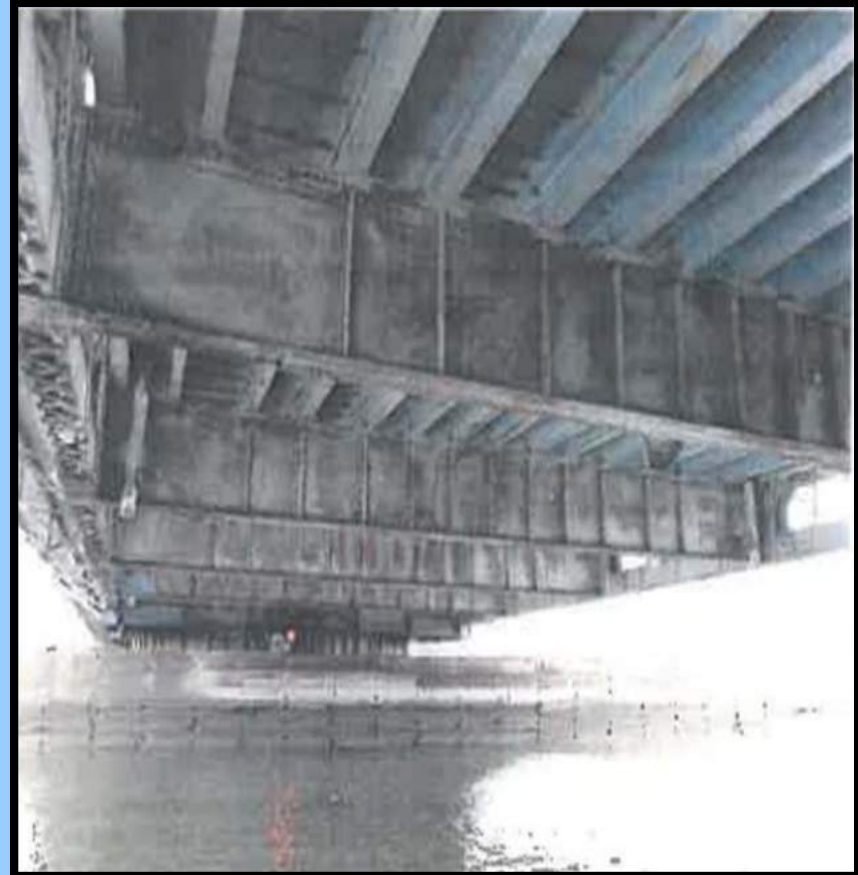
Floor beams in west half of swing span – corrosion and localized section losses
